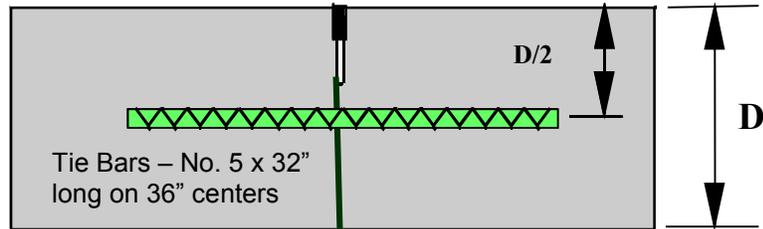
Longitudinal construction joint placed between adjacent lanes. Note the smooth joint through the concrete section.
